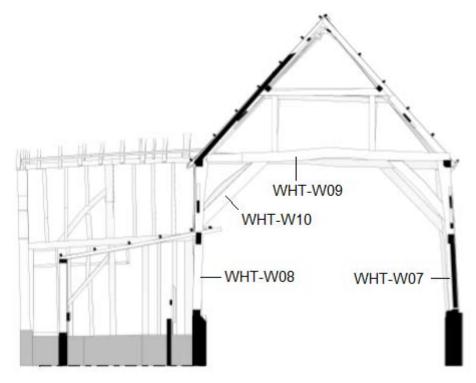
Section through Truss 3, east face, showing the sampled timbers, WHT-W07-10 (after ATD London Ltd)
